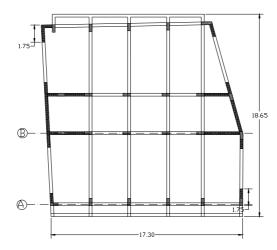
Applied Strengthening by using RC Infills on First Floor Plan
